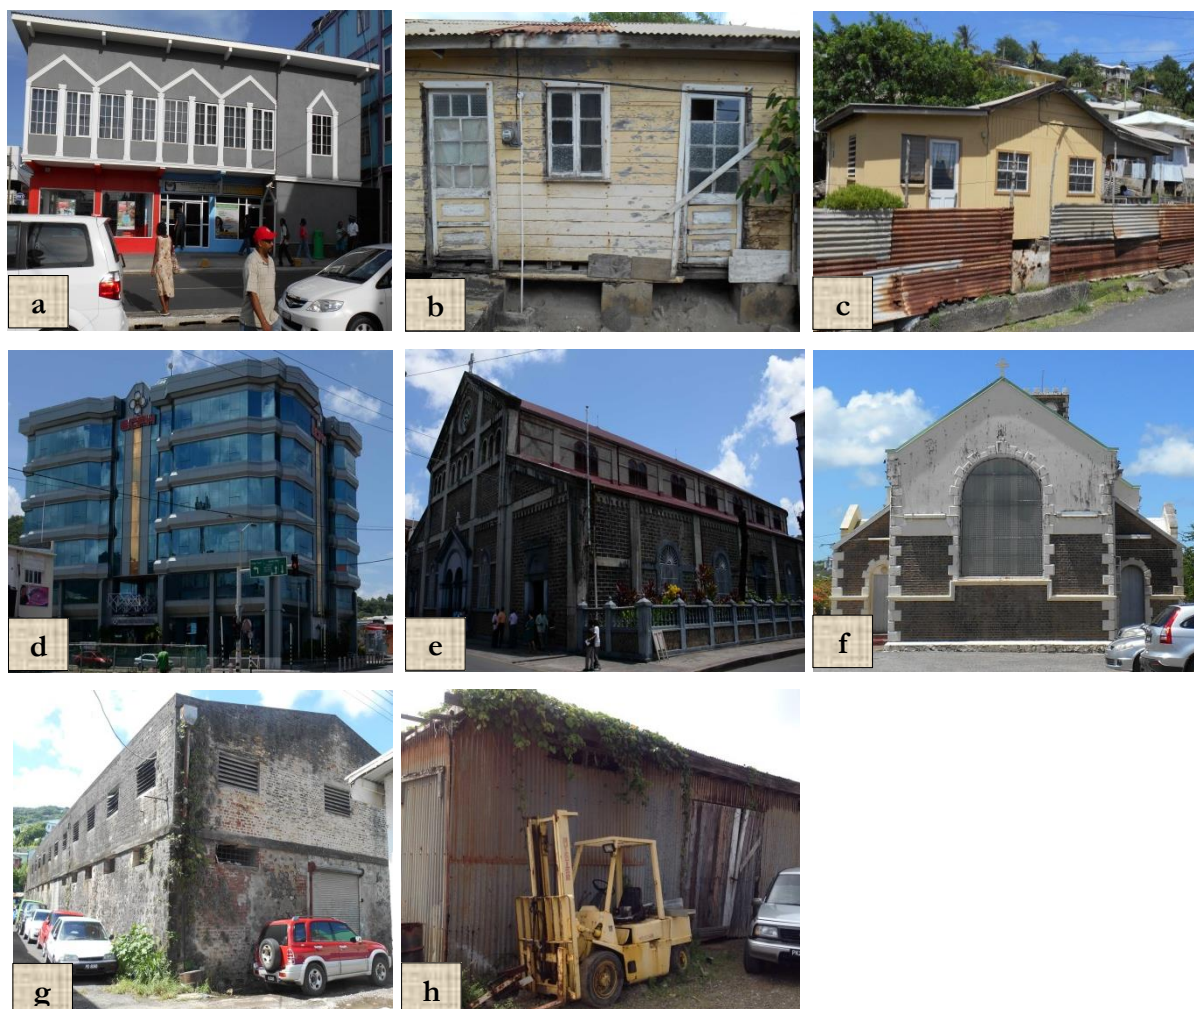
Types of wall (a) Concrete block (b) Wood (c) Wood and Concrete block (d) Glass and Concrete block (e) Stone (f) Brick (g) Brick and Stone (h) Galvanized Iron sheet
